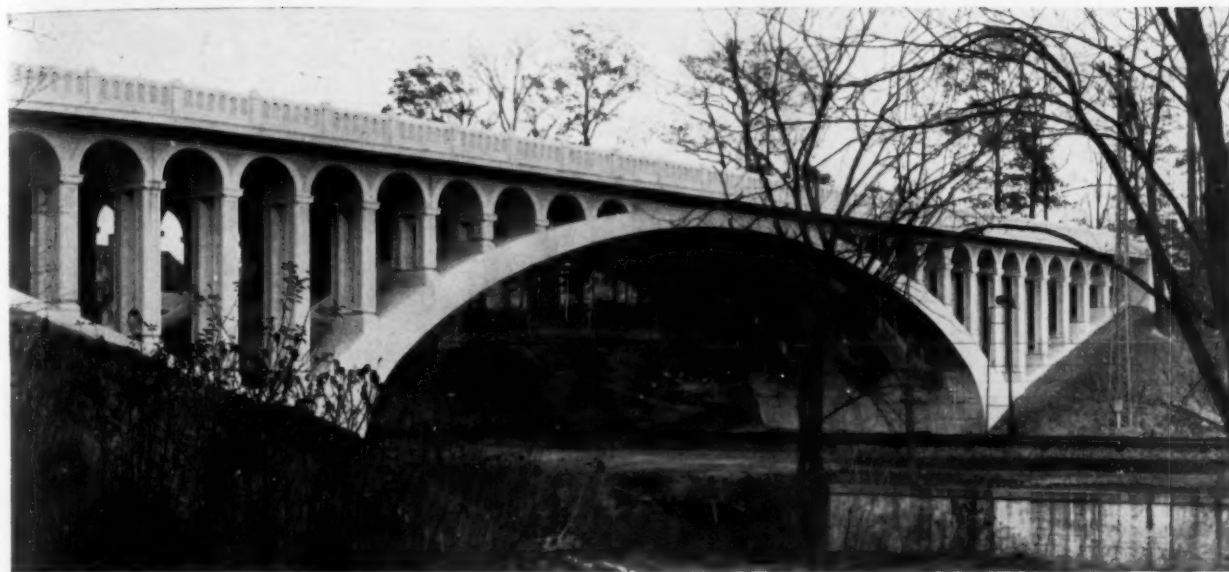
Reinforced Concrete Bridge, Bronx River Parkway, near White Plains, N. Y.
